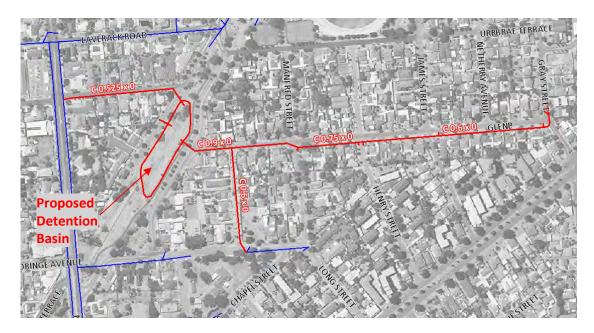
Glenburnie Terrace Drainage and Detention Basin Layout
